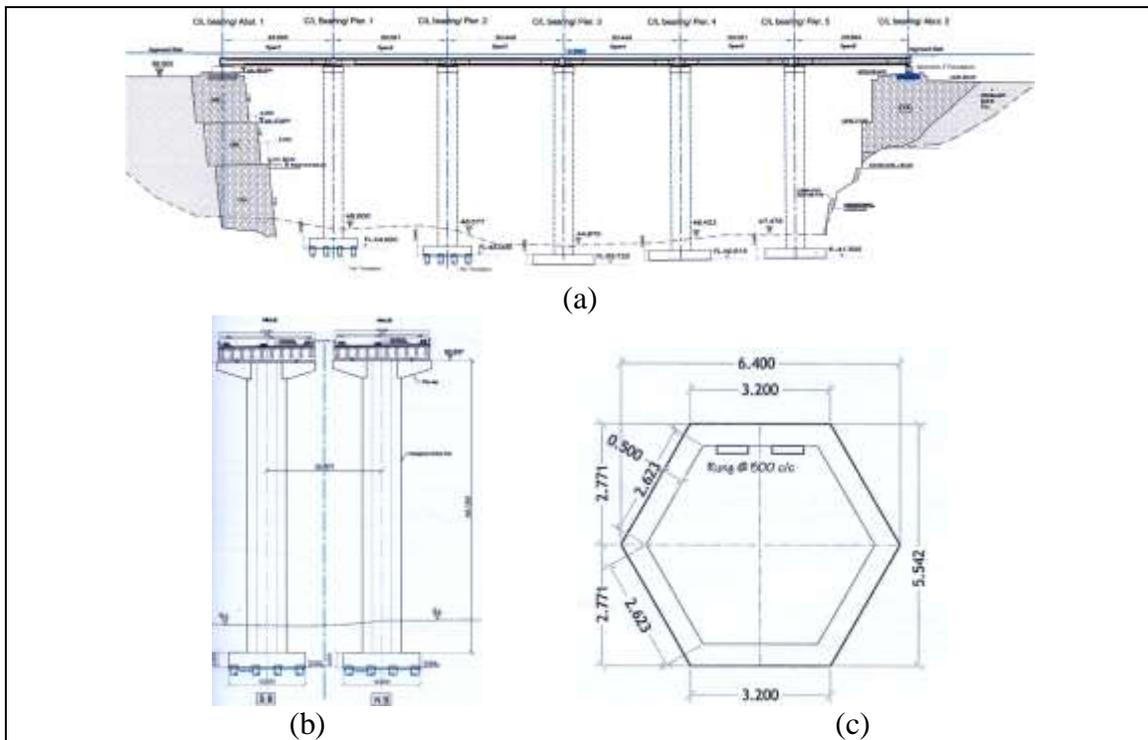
Schematic diagram of Wadi Adai - Amerat Bridge a) Longitudinal section, b) Elevation detail and c) cross section detail of pier
